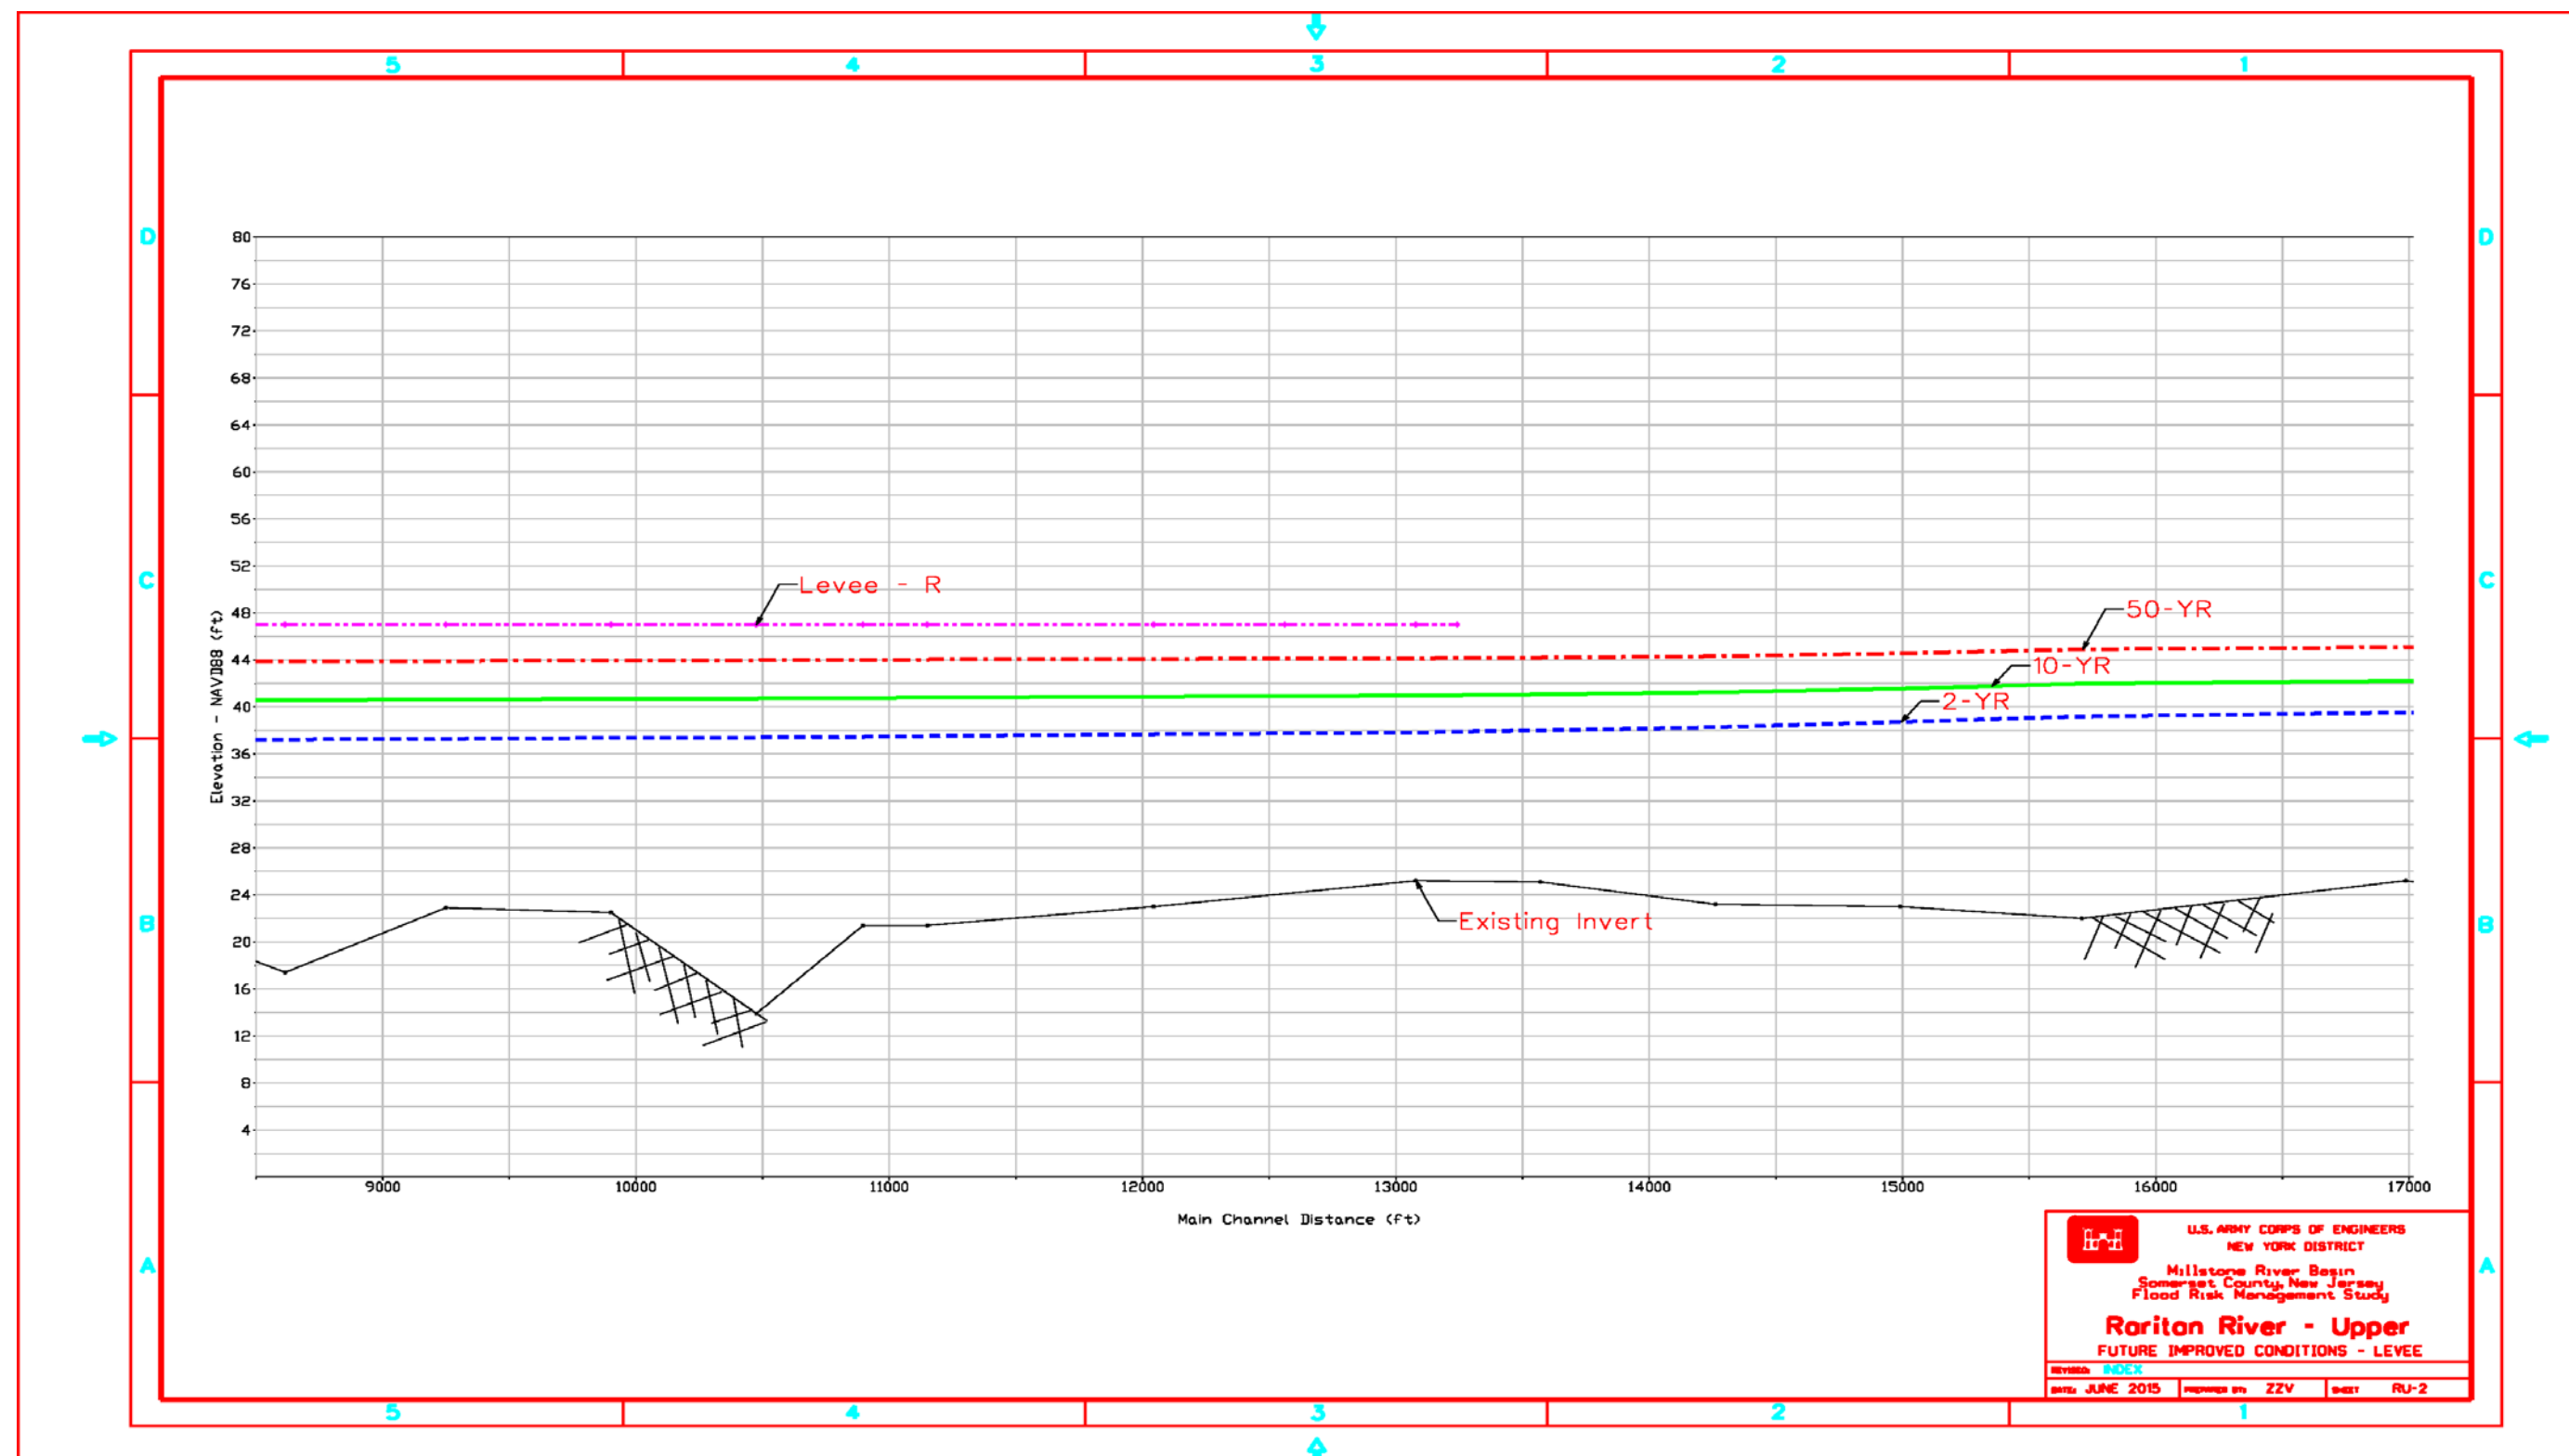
MAXIMUM WATER SURFACE PROFILE FOR LEVEE & FLOODWALL PLAN - FUTURE IMPROVED CONDITIONS (RARITAN RIVER UPPER)
